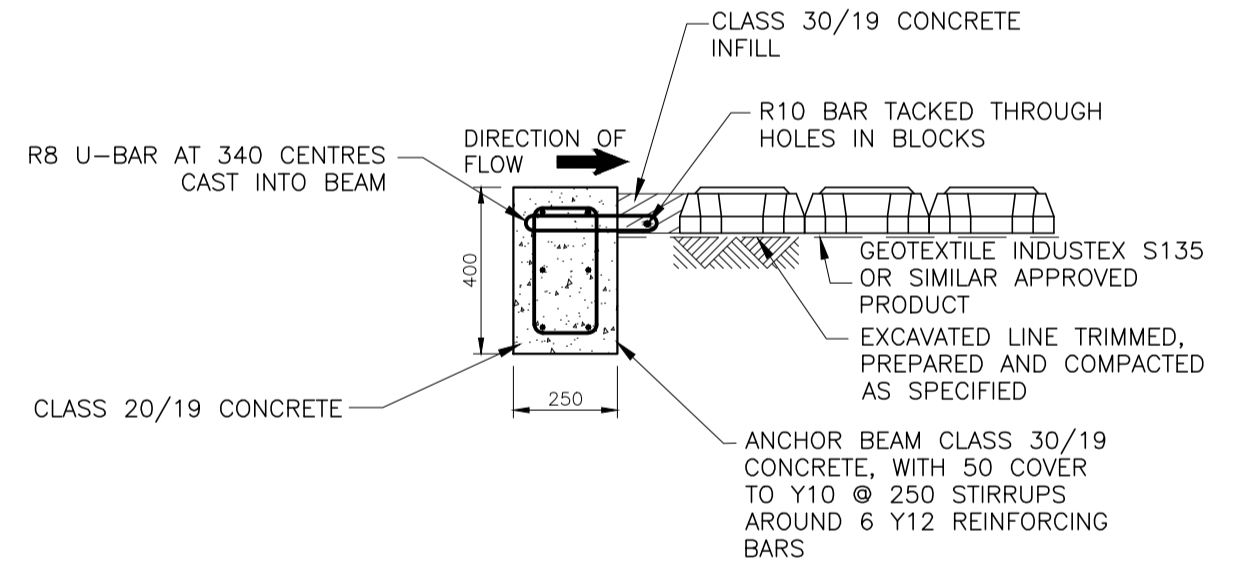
DETAIL FOR CONNECTION TO CULVERT OUTLET STRUCTURE
